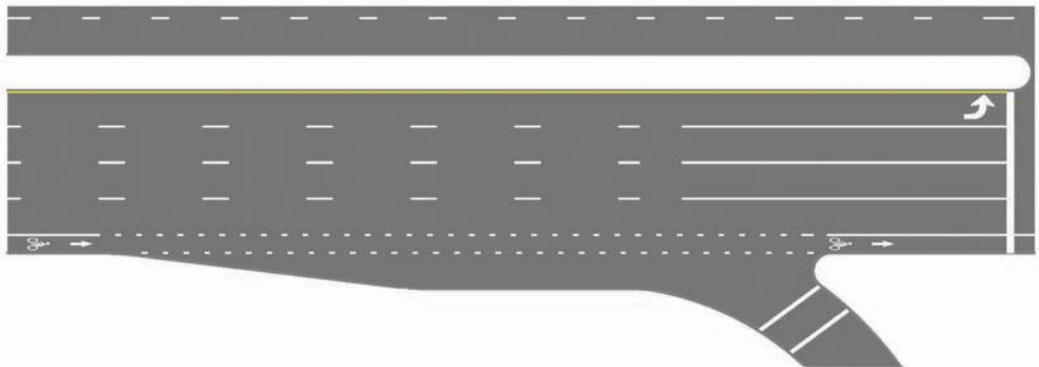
Example of Bike Lane and Diverging Roadway on an Arterial Street
